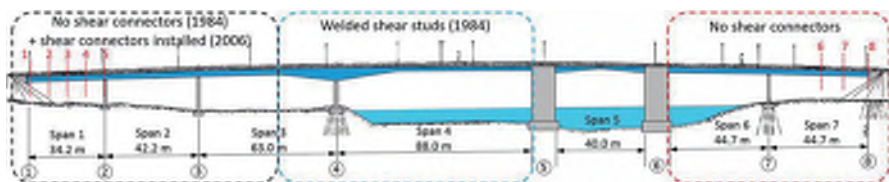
Elevation drawing of the Pitsund Bridge illustrating the different types of shear connection
